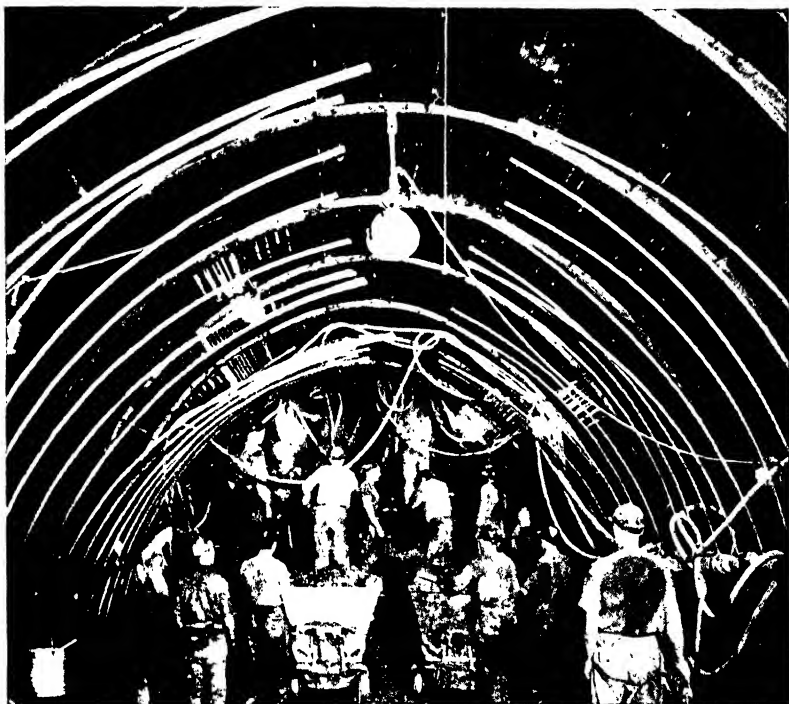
Ribs and plates in a Chicago sewer tunnel. As this was fairly good ground, plates were placed longitudinally to allow wider spacing of ribs. Reinforcing bars were set in the invert concrete which was carried to the face of the bench. (Courtesy of Commercial Shearing & Stamping Co.)
